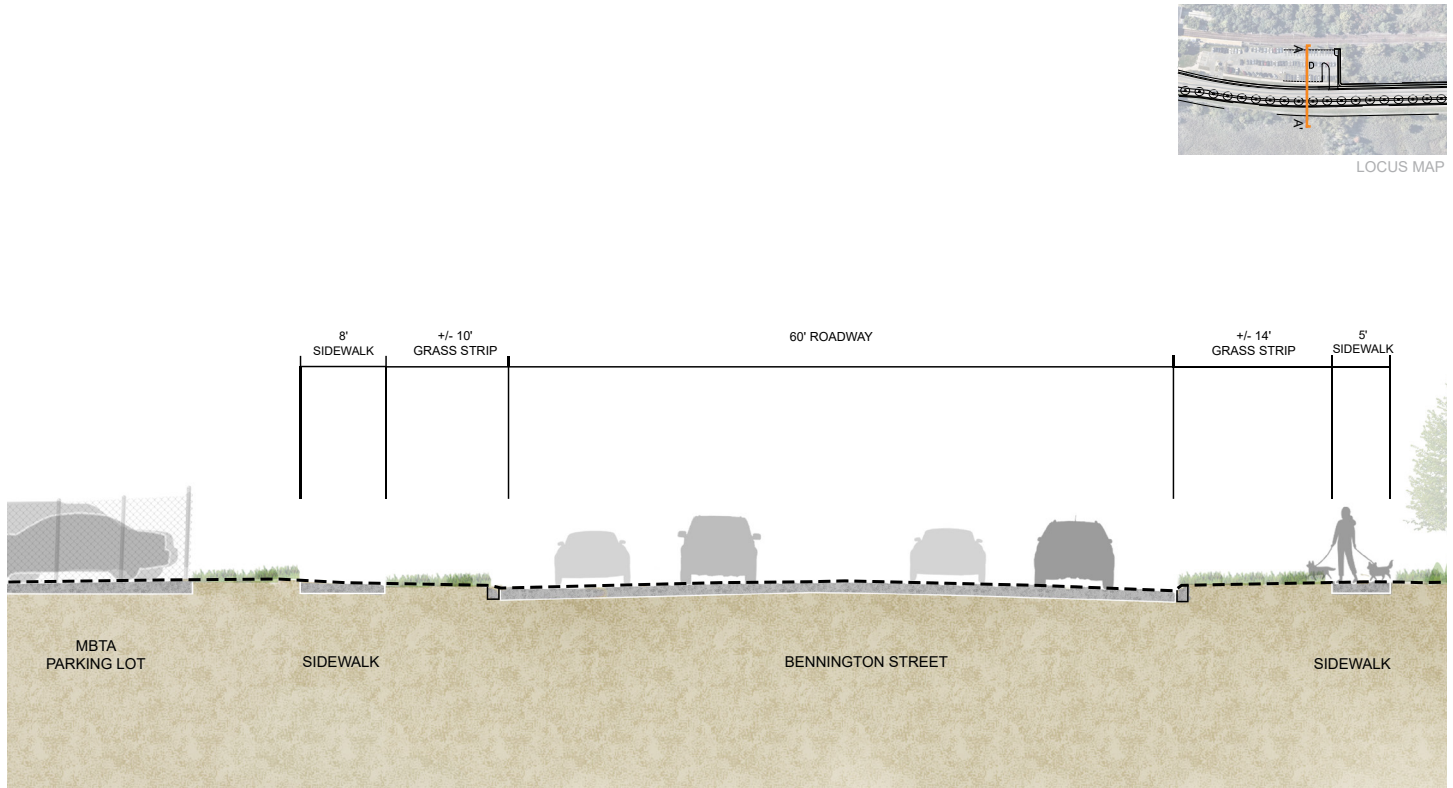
B: Bennington Street Cross-Section at MBTA Suffolk Downs Parking Lot - Proposed Conditions
